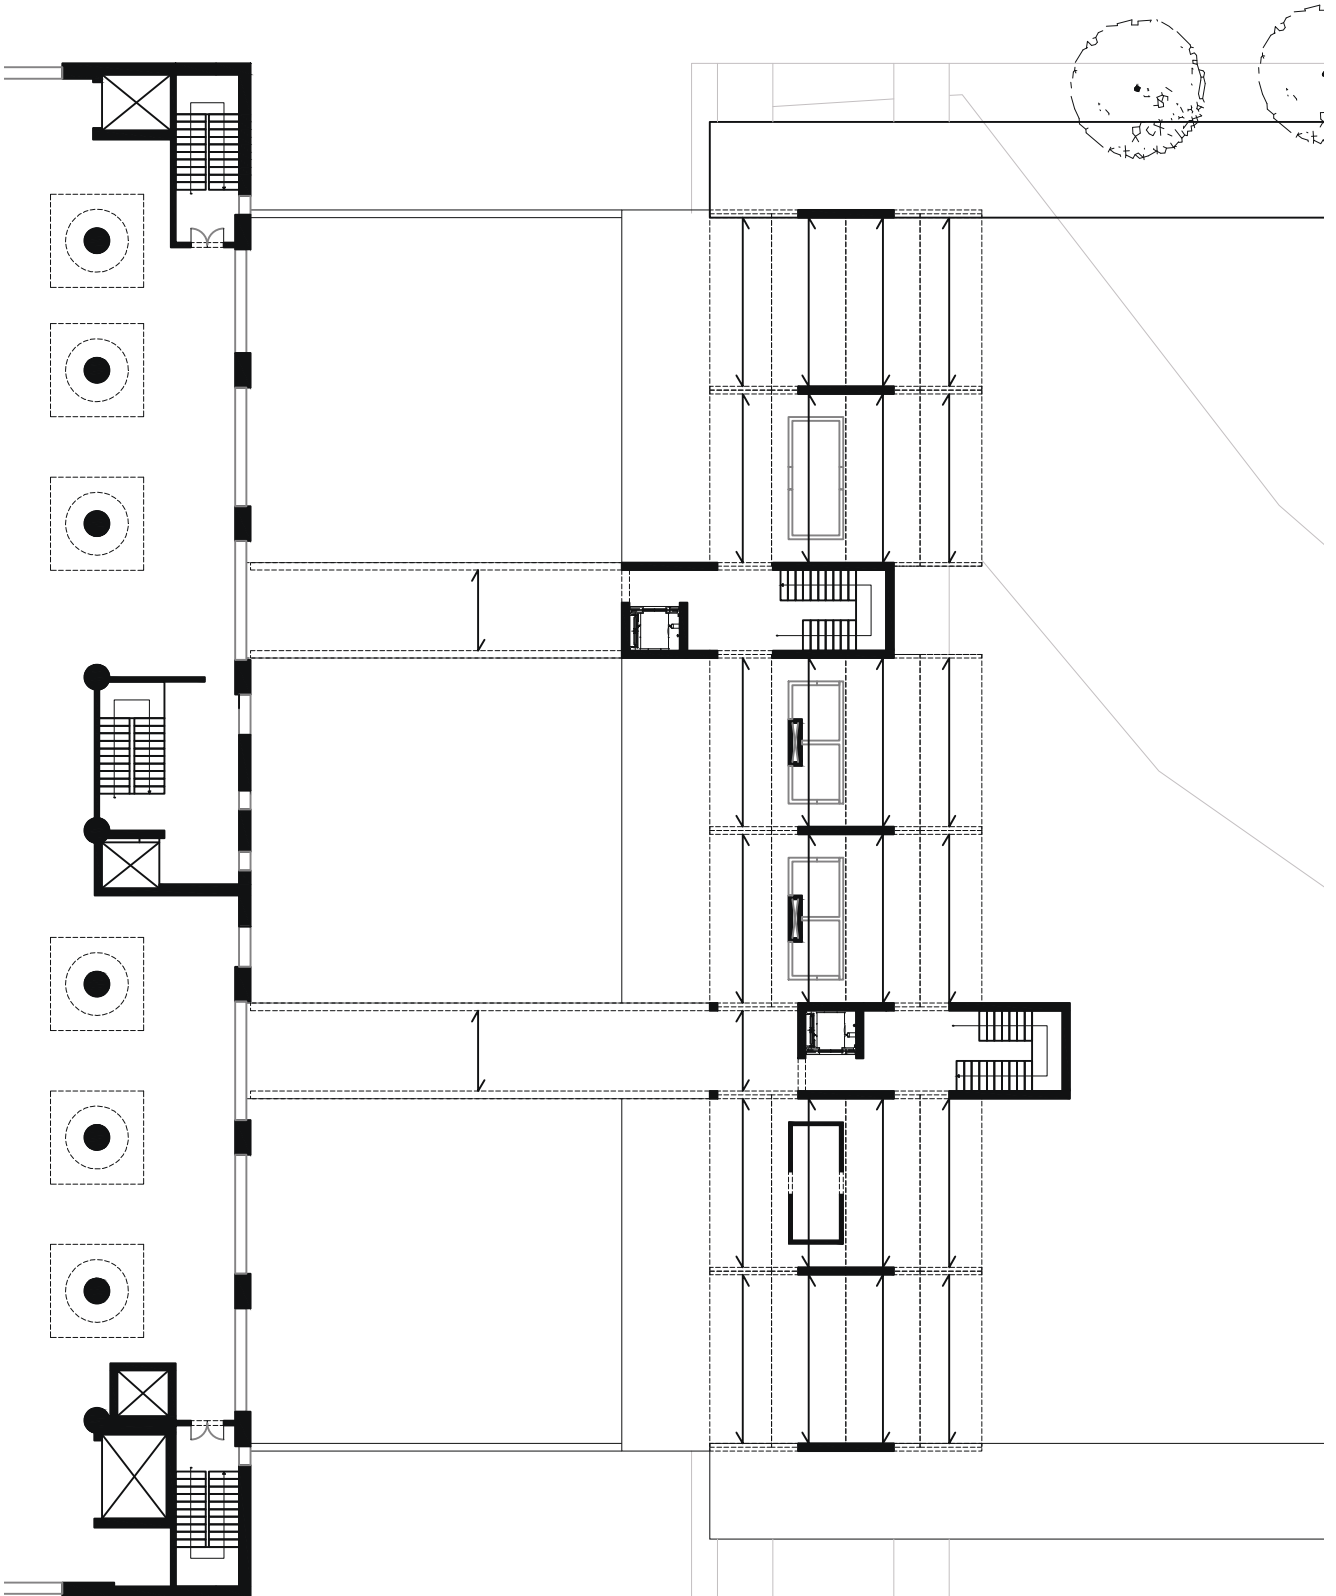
STRUCTURAL SCHEME FOR A TYPICAL FLOOR OF THE .R-SITE
